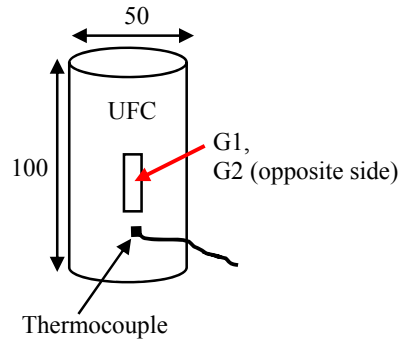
Details of UFC compression test specimen (Units: mm)
